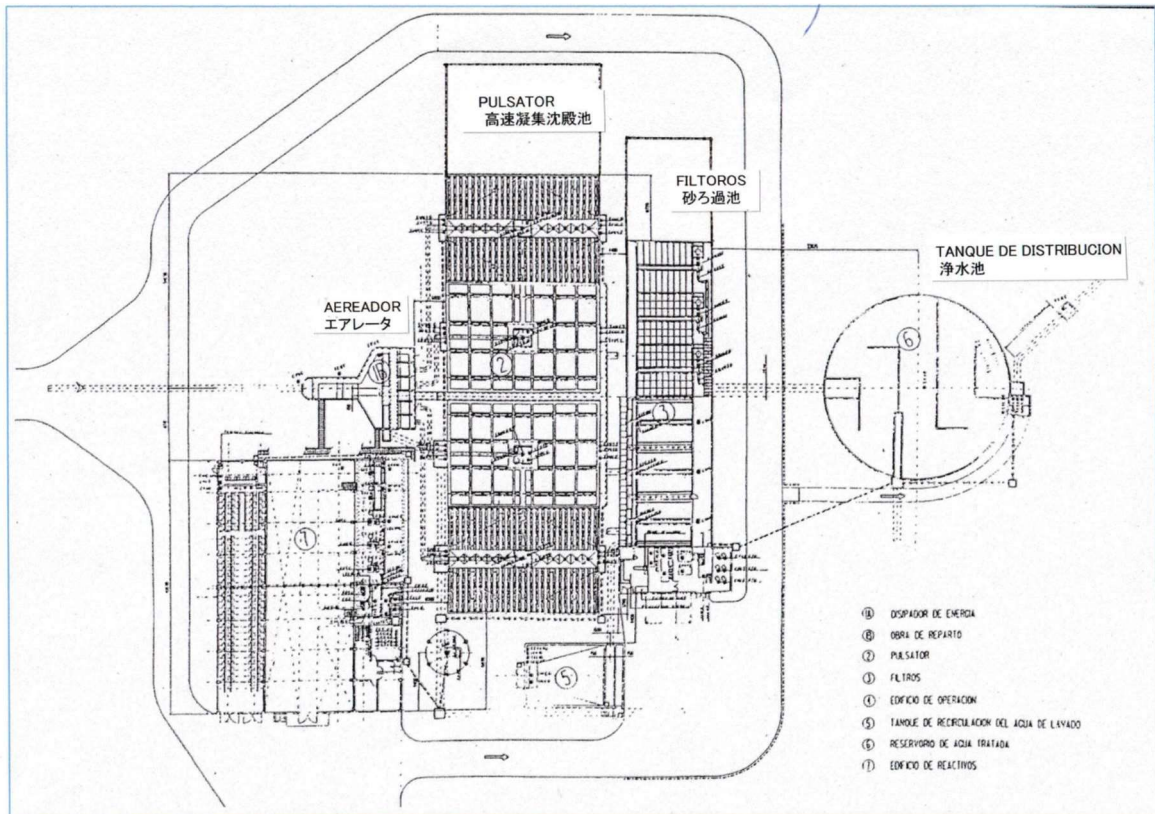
General Plan of Concepción Water Treatment Plant
